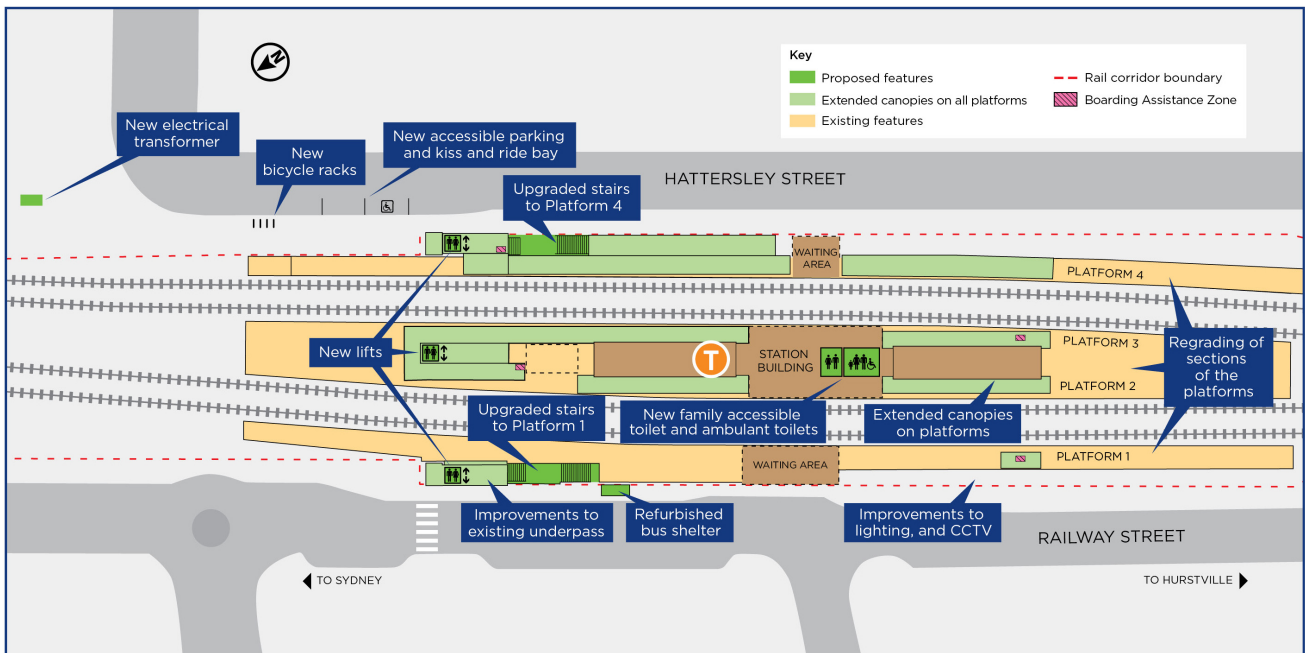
Banksia Station Site Plan (Source: TfNSW)
